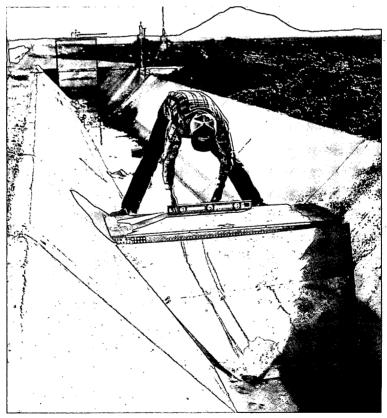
The sill of a temporary sheet metal weir should be level. The bends at the corner of the structural angles can be used to secure the sill to the canal wall. After the sill is leveled and secured, the upstream ramp is attached. (Arizona).
